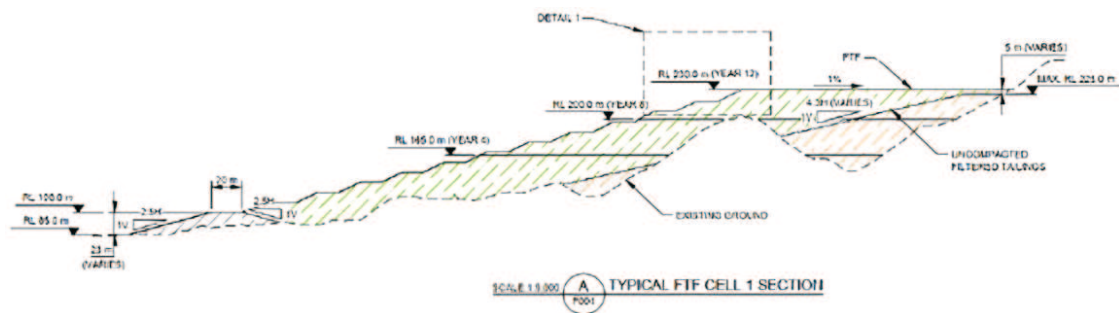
Filtered Tailings Facility Cell 1 Typical Section
